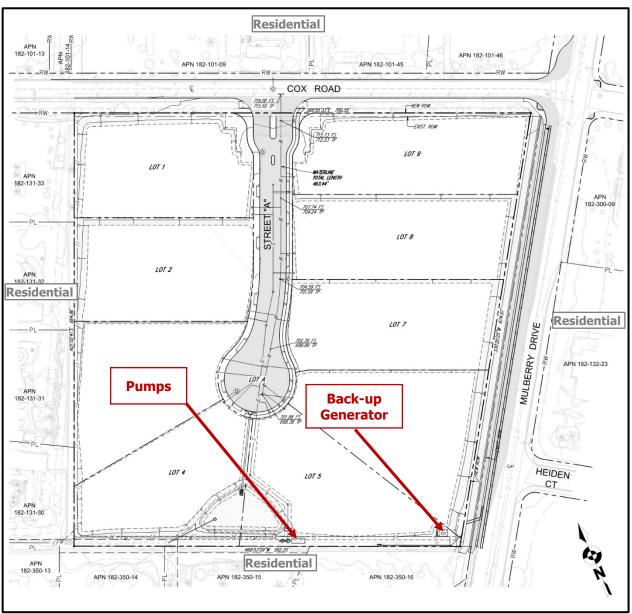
Proposed Sewer Pump/Lift Station Site Plan
